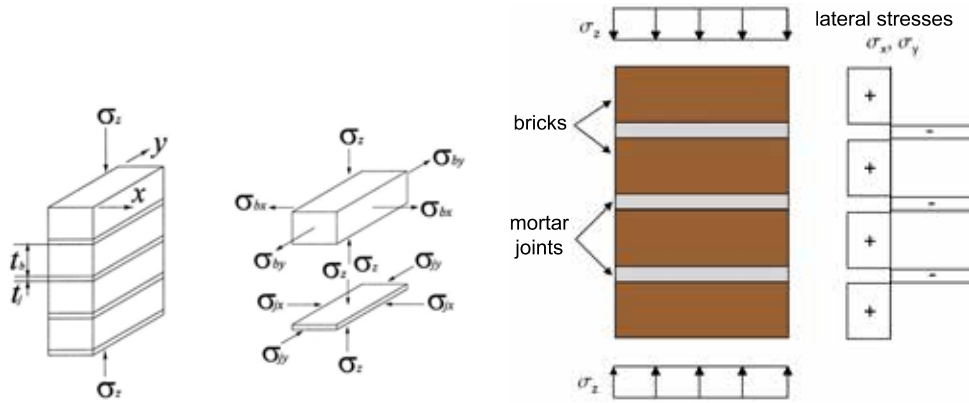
Stresses in a masonry prism undergoing compression loading.
